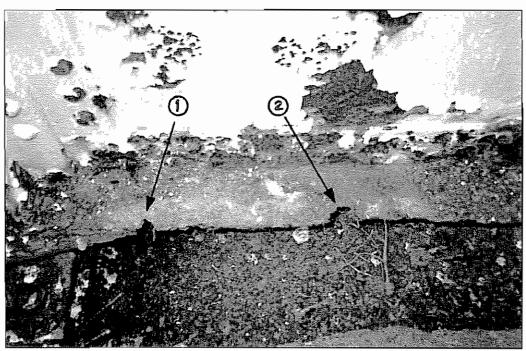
View of the truss fixed bearing of Span 3, left side. Note corrosion and section loss along the bottom of the webs of the bearing pedestal 1-beams.
